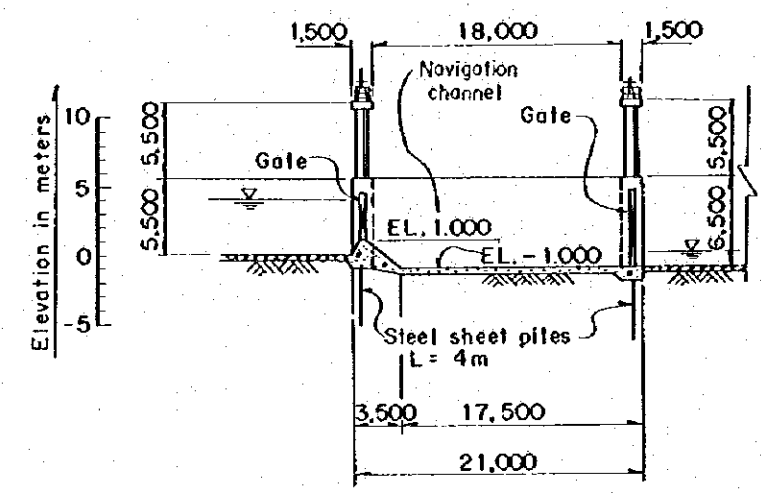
Alternative I : General Layout of Intake Weir and Connecting Channel
